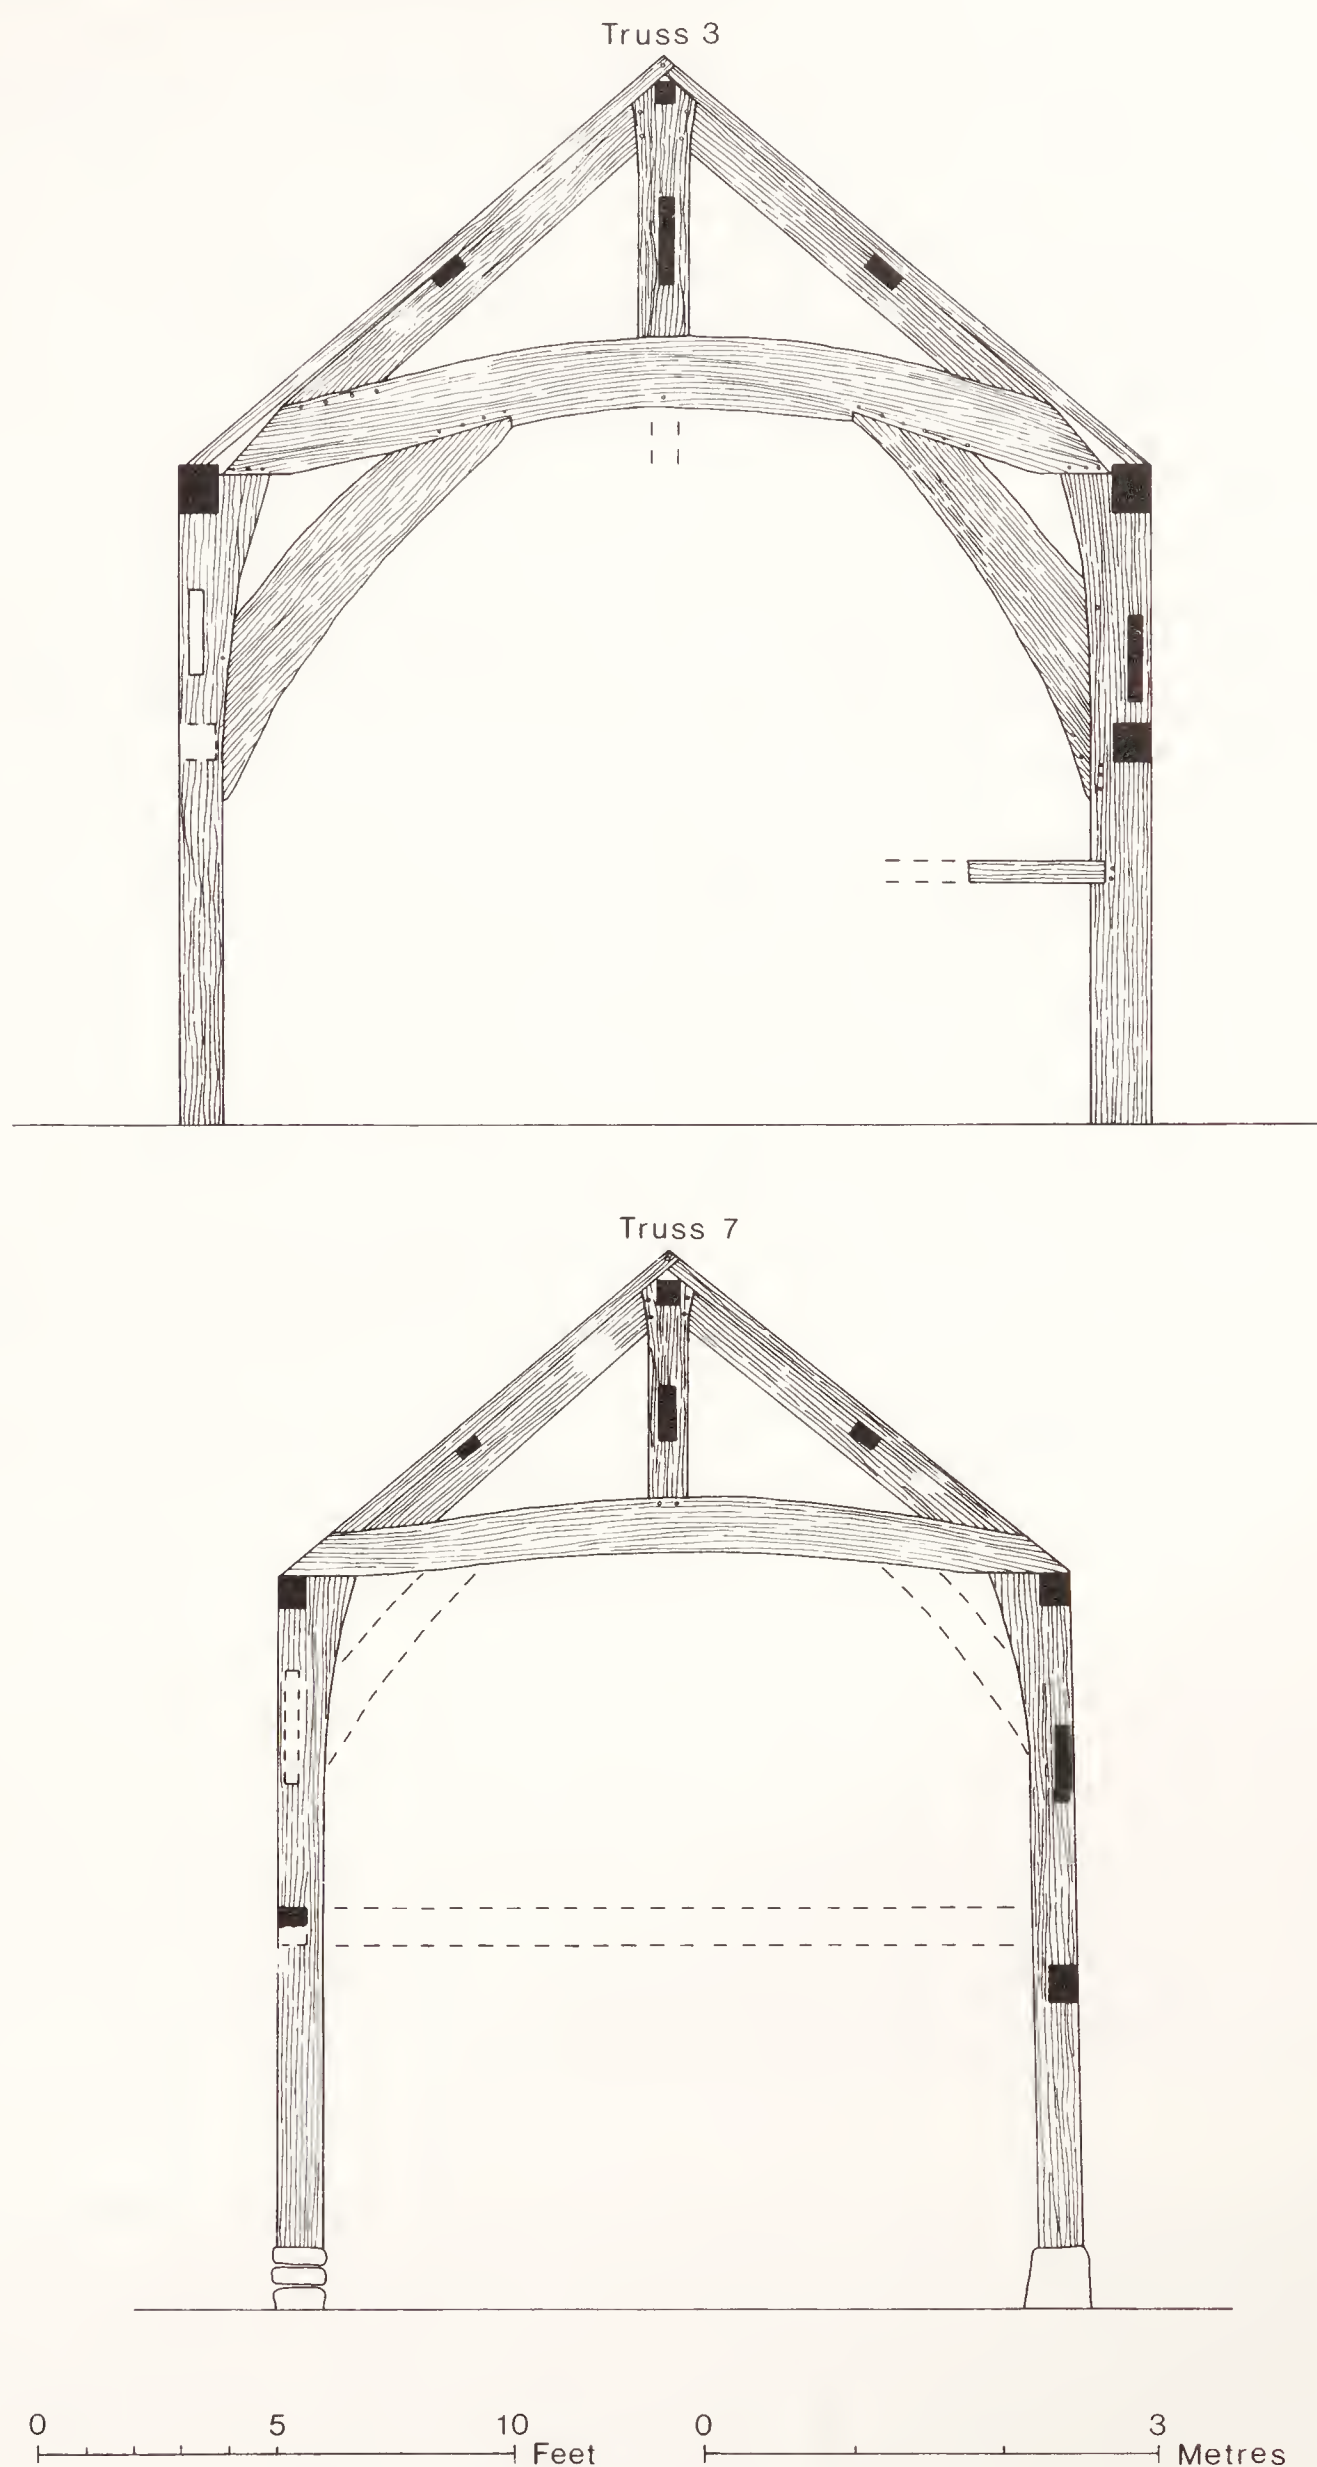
Top*: Truss 3; open truss over hall, from south-east.
